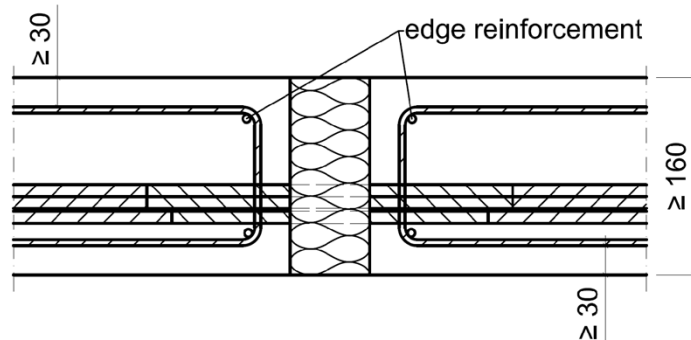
Example of Schöck Isokorb® Type H with SCE and on-site reinforcement
